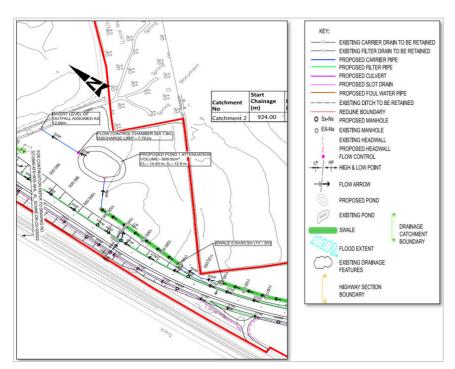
Proposed Pond 1 – layout and discharge location
